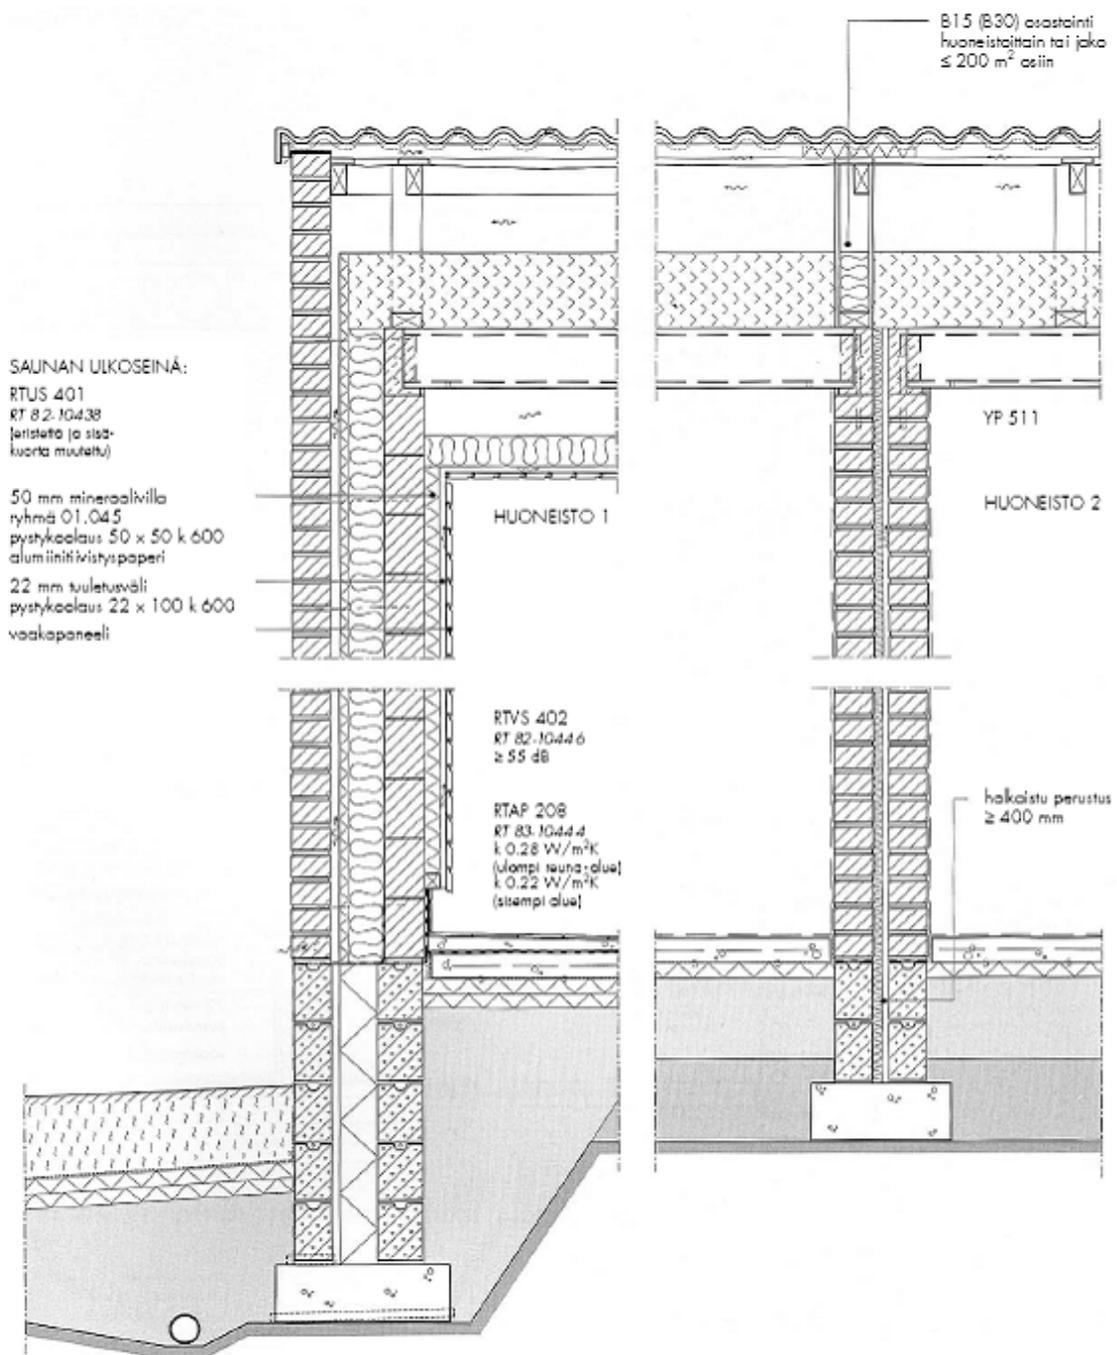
Examples of the structures of the brick house. 1 end up, an exterior wall, sauna state and the partition of flats /5/
